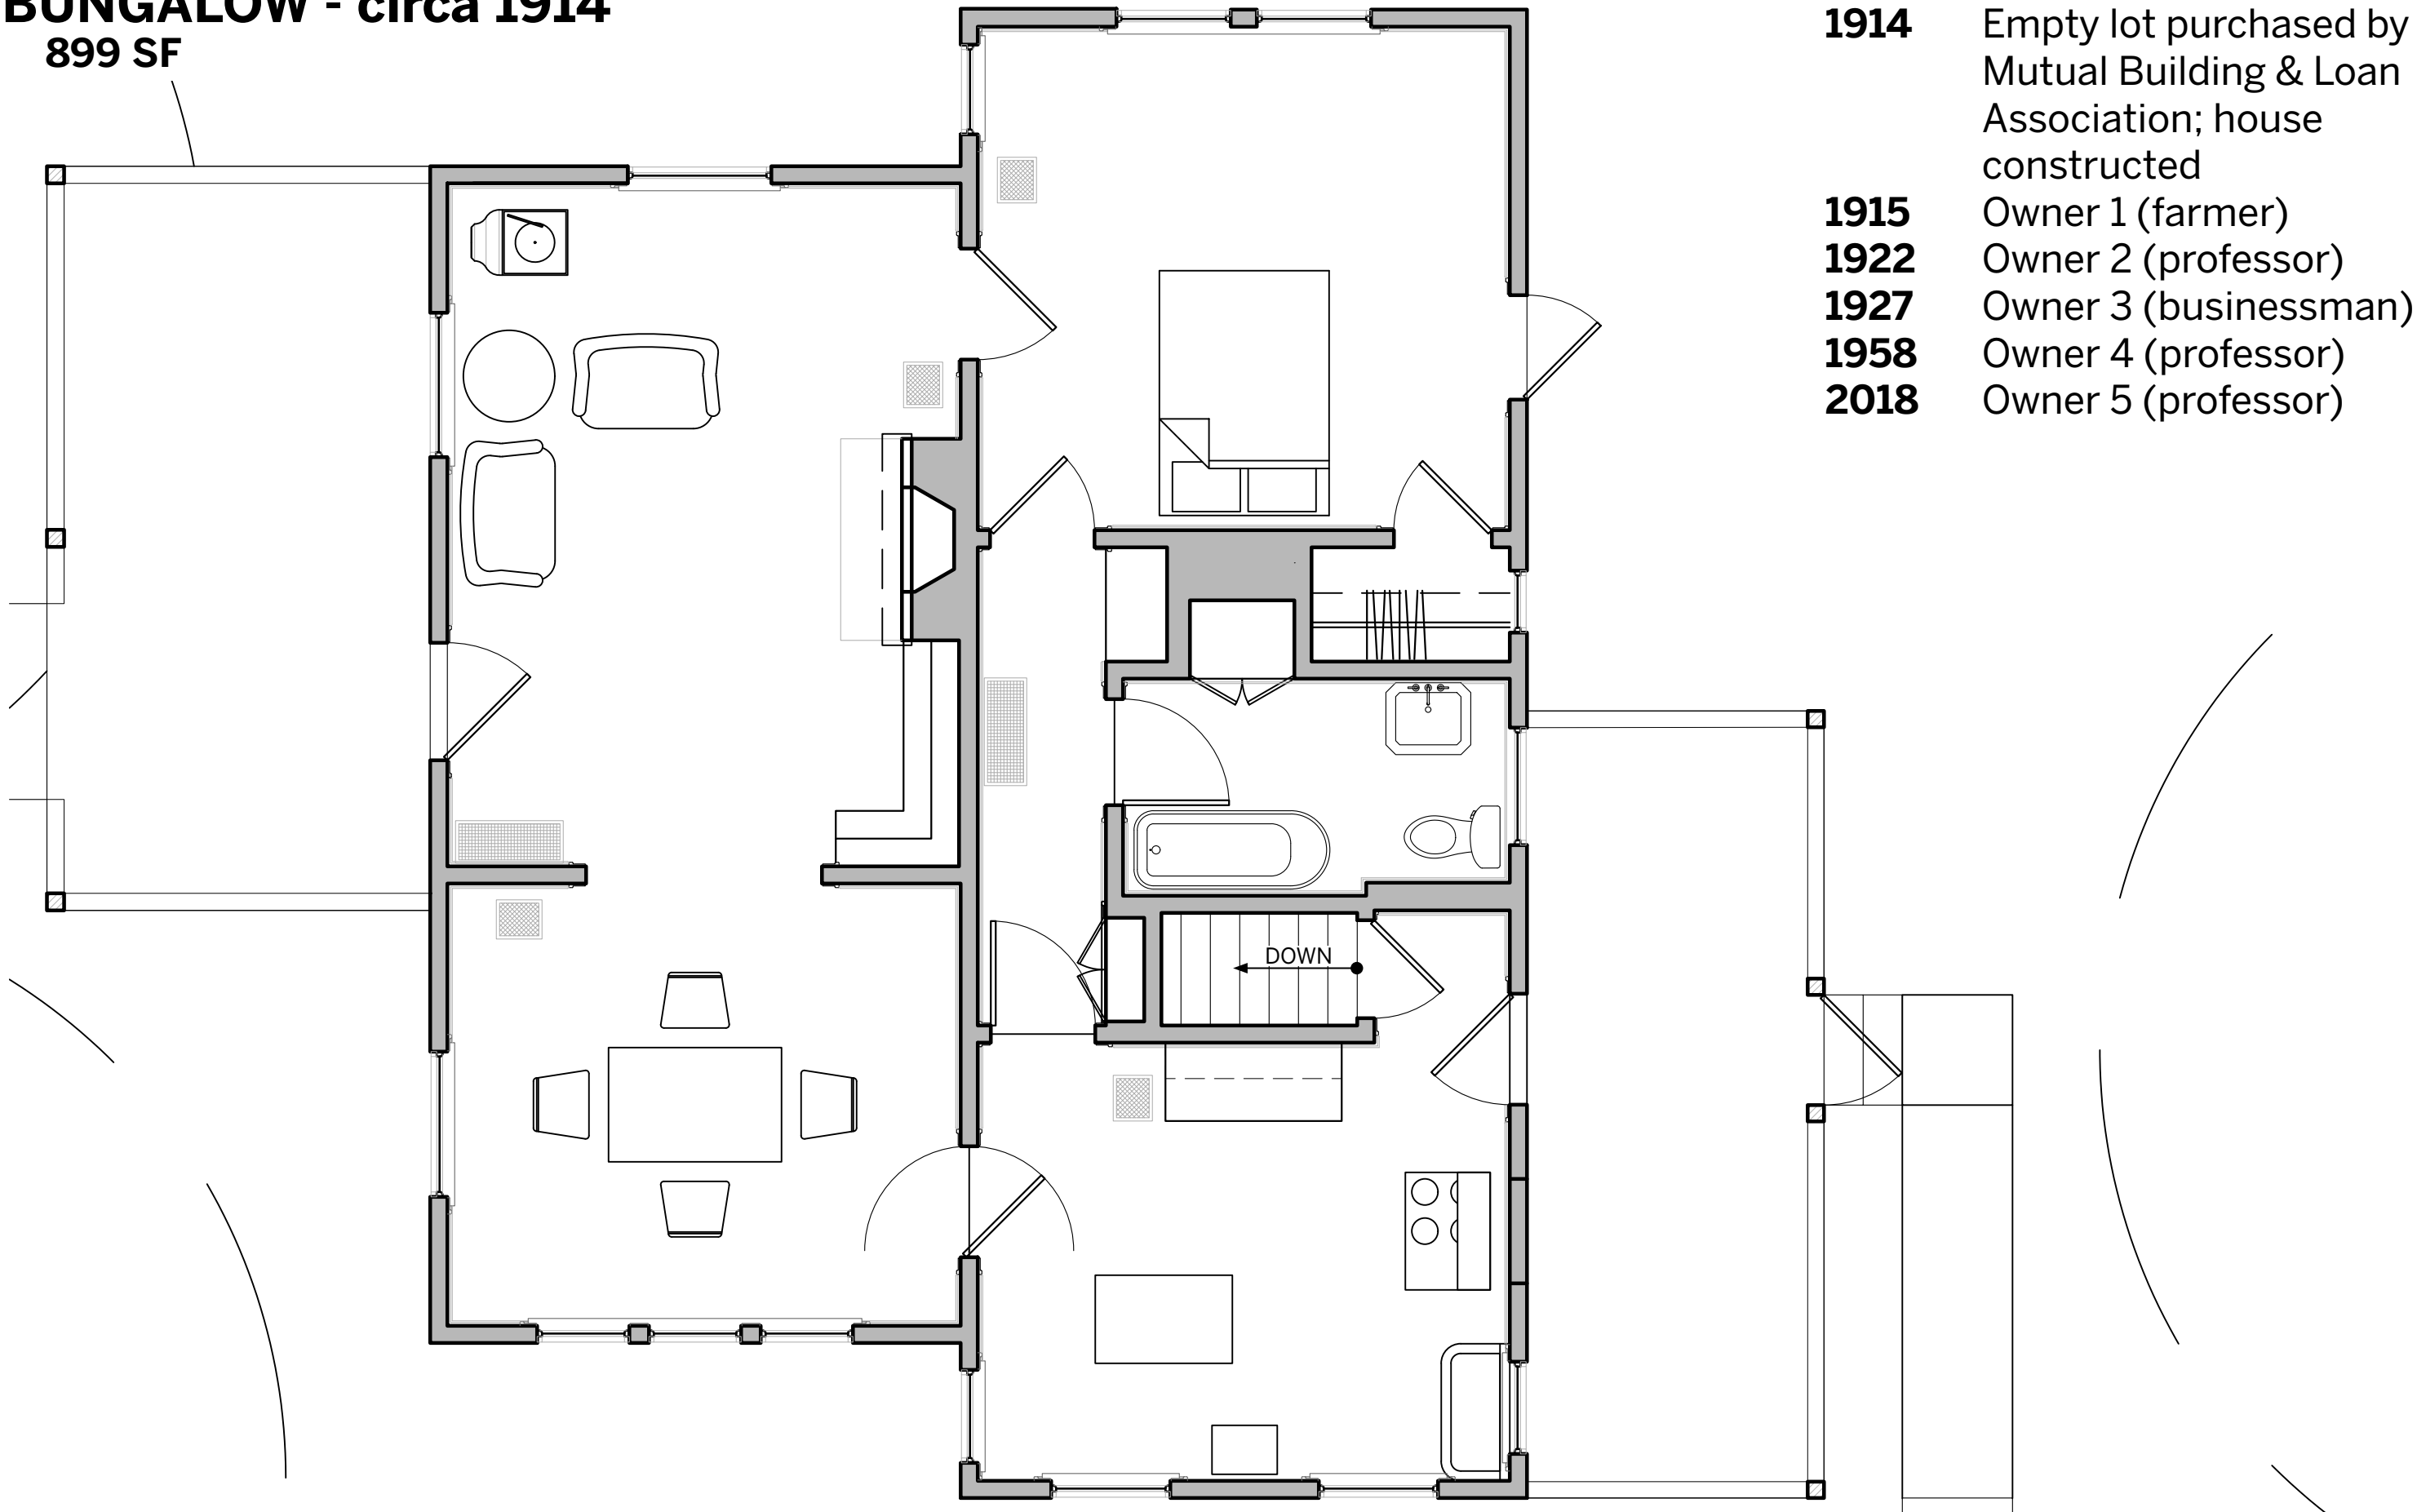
IMAGE: Floor plan of the c. 1914 bungalow (living room, dining room, kitchen, hall, bathroom, and bedroom) with front and back porches (drawing by author).
